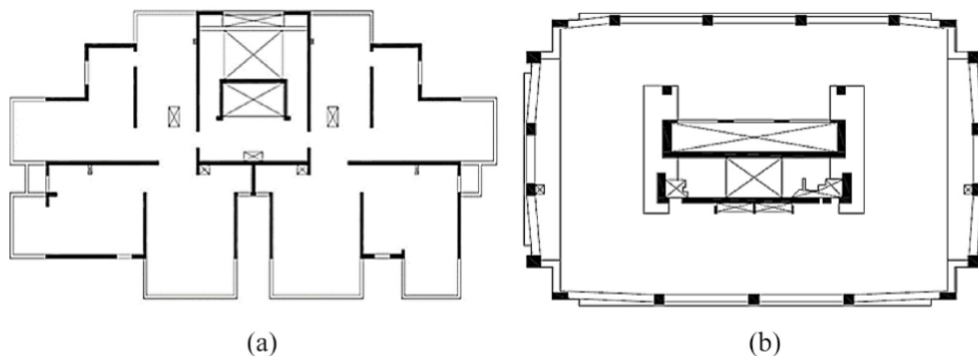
Typical Chilean wall lateral resistance system configuration (a) Residential building (b) Office building. From Lagos et al. [3].
